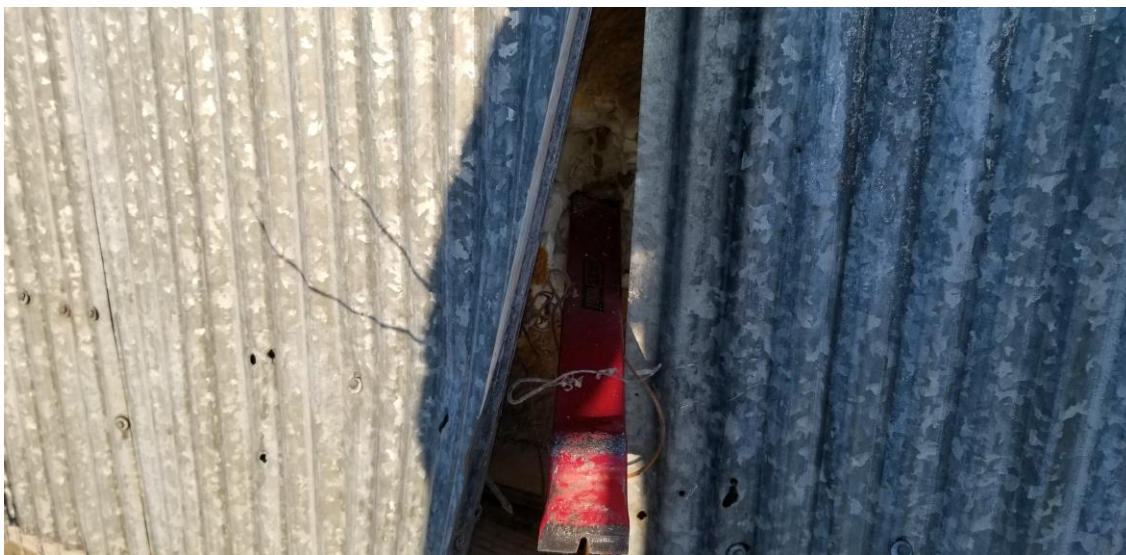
This photo shows the exterior construction of the building which consists of corrugated metal overtop foam board. There were no suspect materials associated with the exterior wall construction.
